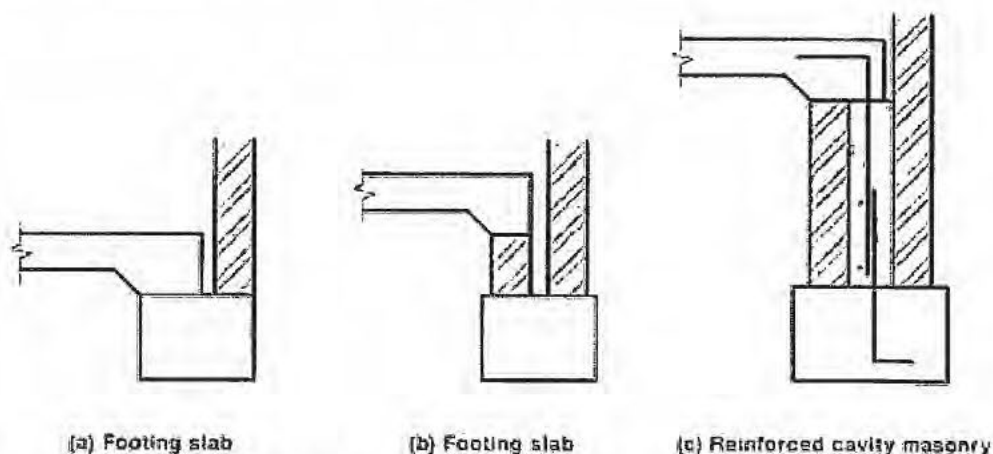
EXAMPLES OF FOOTING SYSTEMS REQUIRING JOINT TREATMENTS
